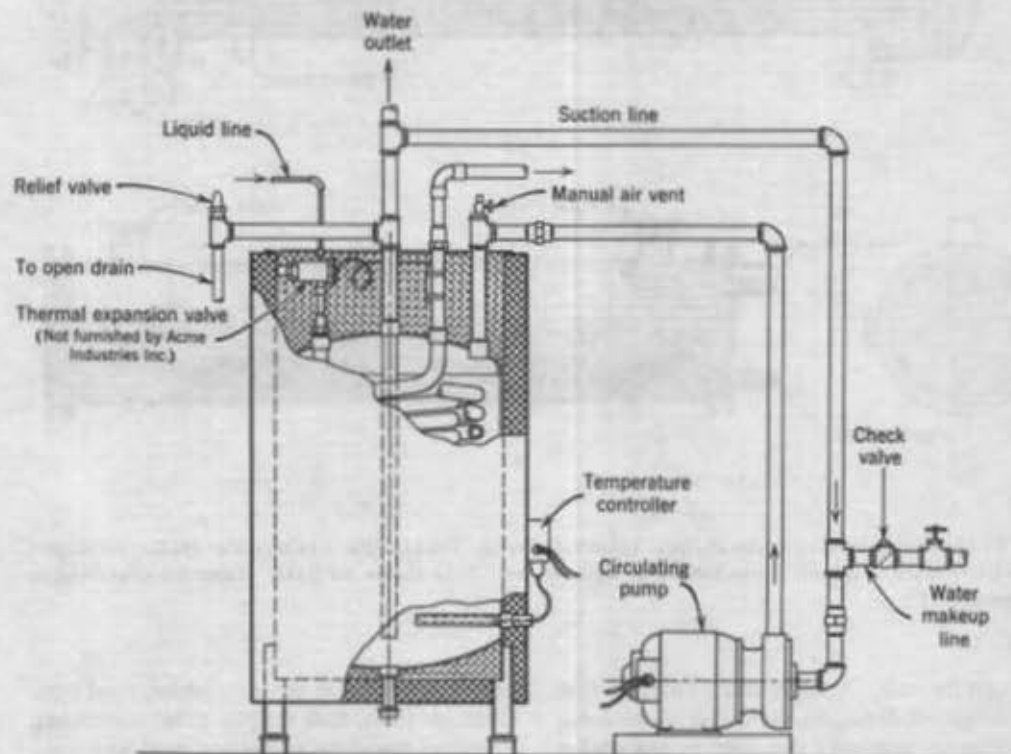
Shell-and-coil cooler. (Courtesy Acme Industries.)
